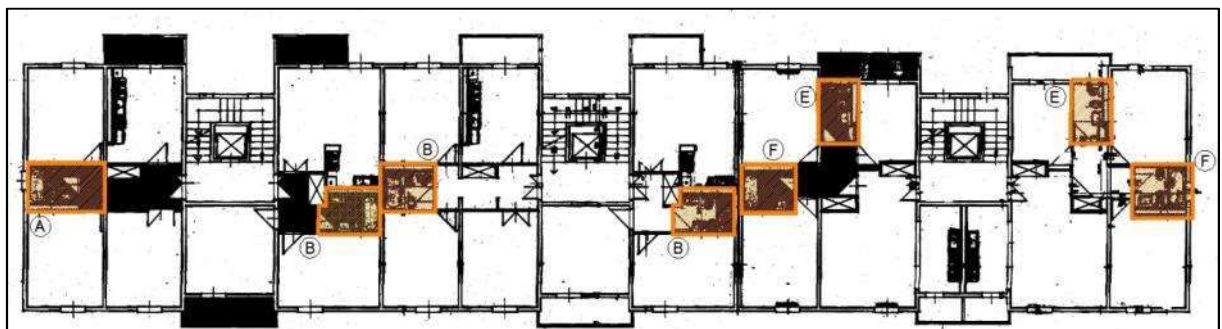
Toilets Layout Building B. In orange the bathroom types.
